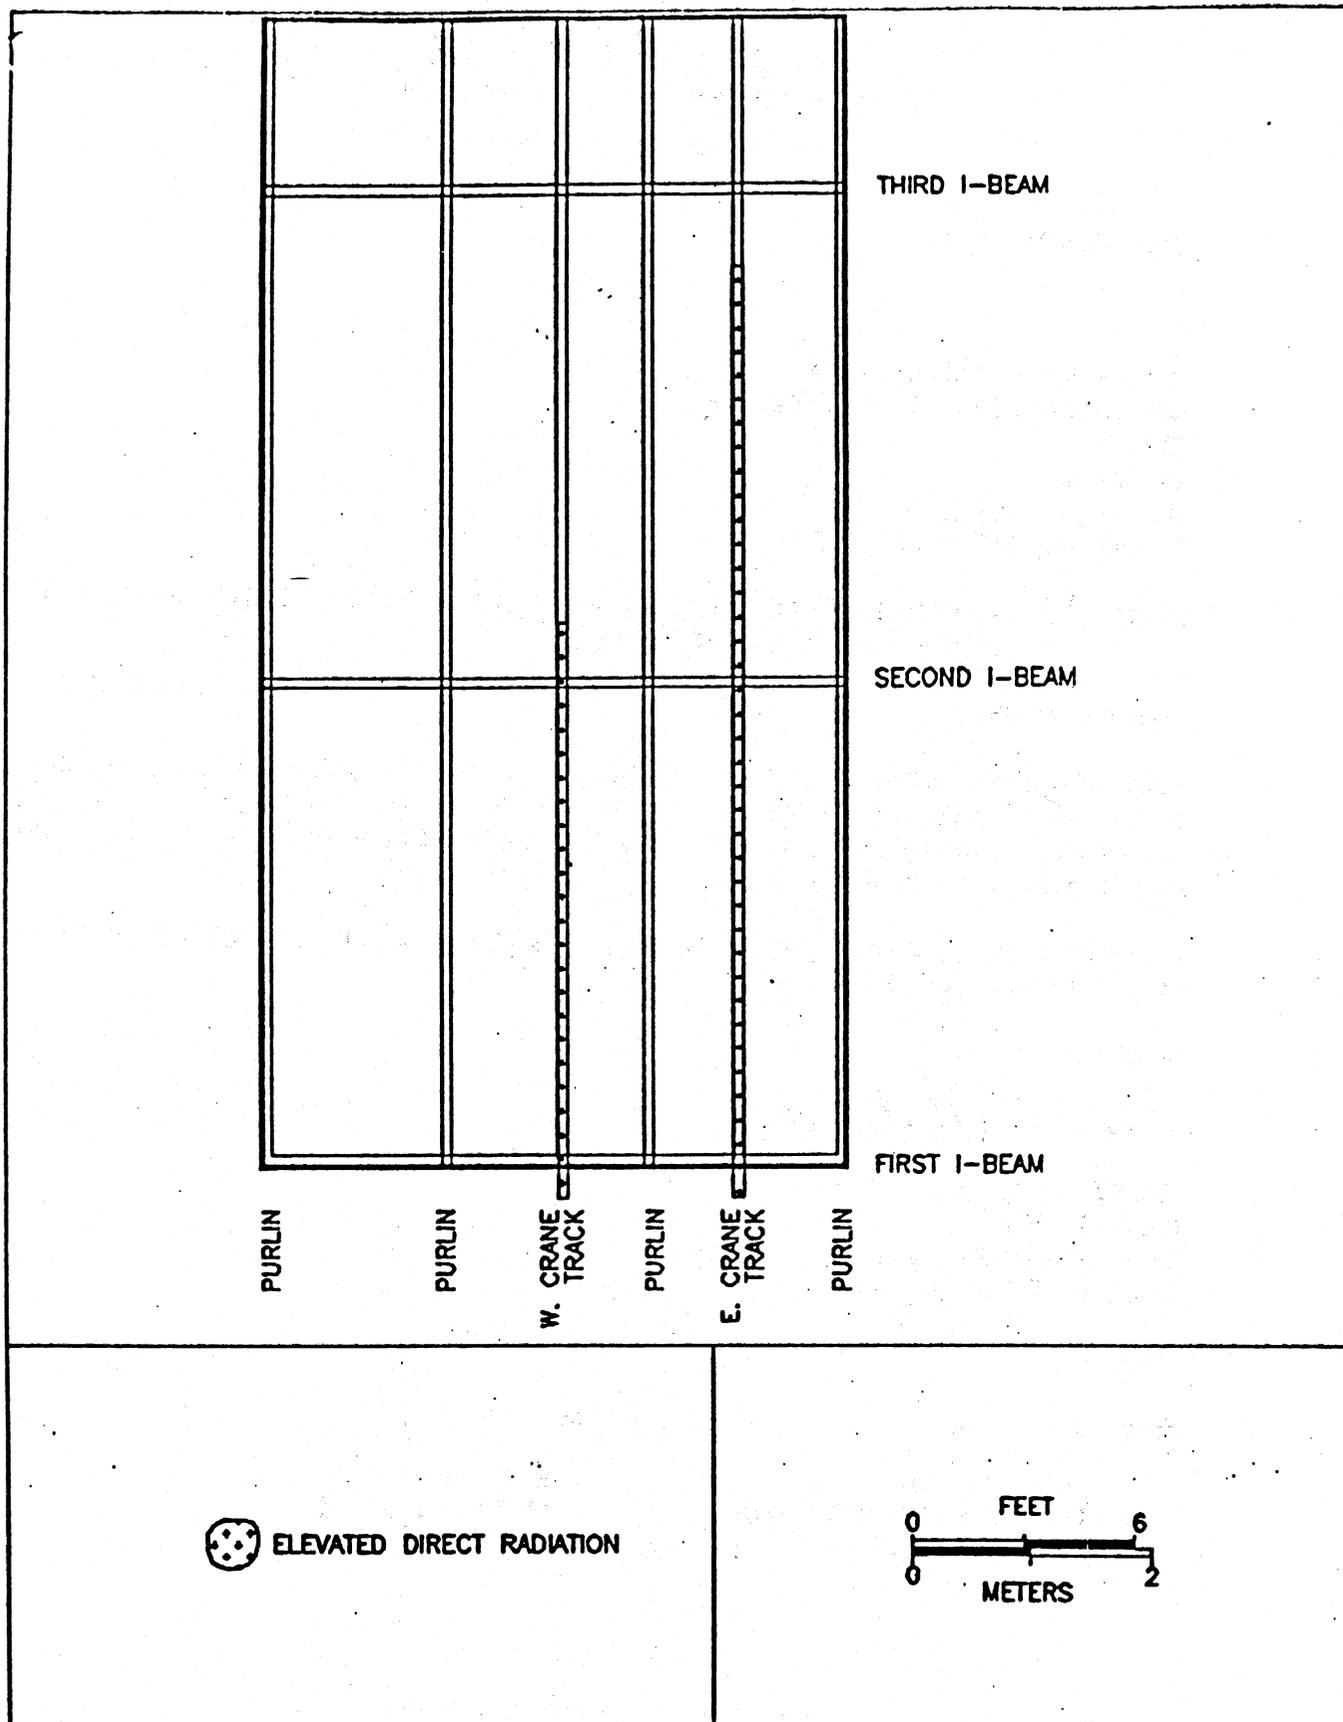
Building 8, Room B, Overheads (Looking Down From Above) – Areas Exceeding Guidelines
